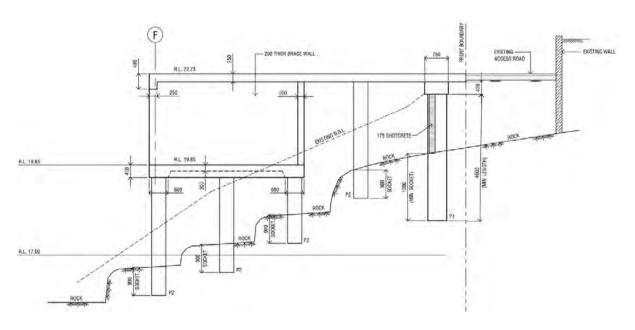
Footings and slab section 1 (Entry level RL22.73, upper level RL19.85 and mid-level RL17.00)
